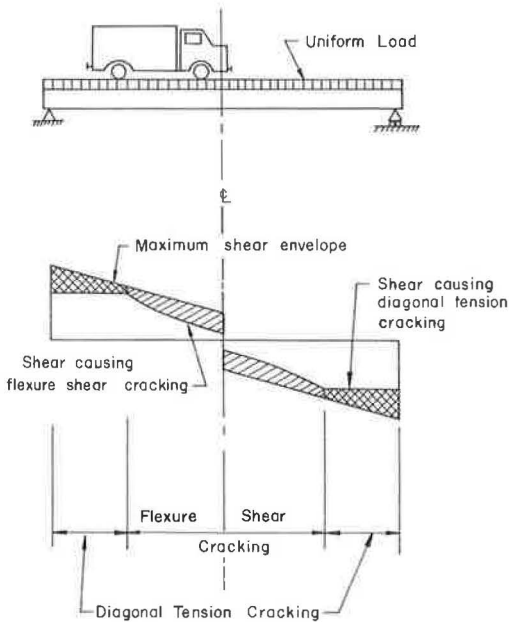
Behavior of simply supported prestressed beam with web reinforcement.
